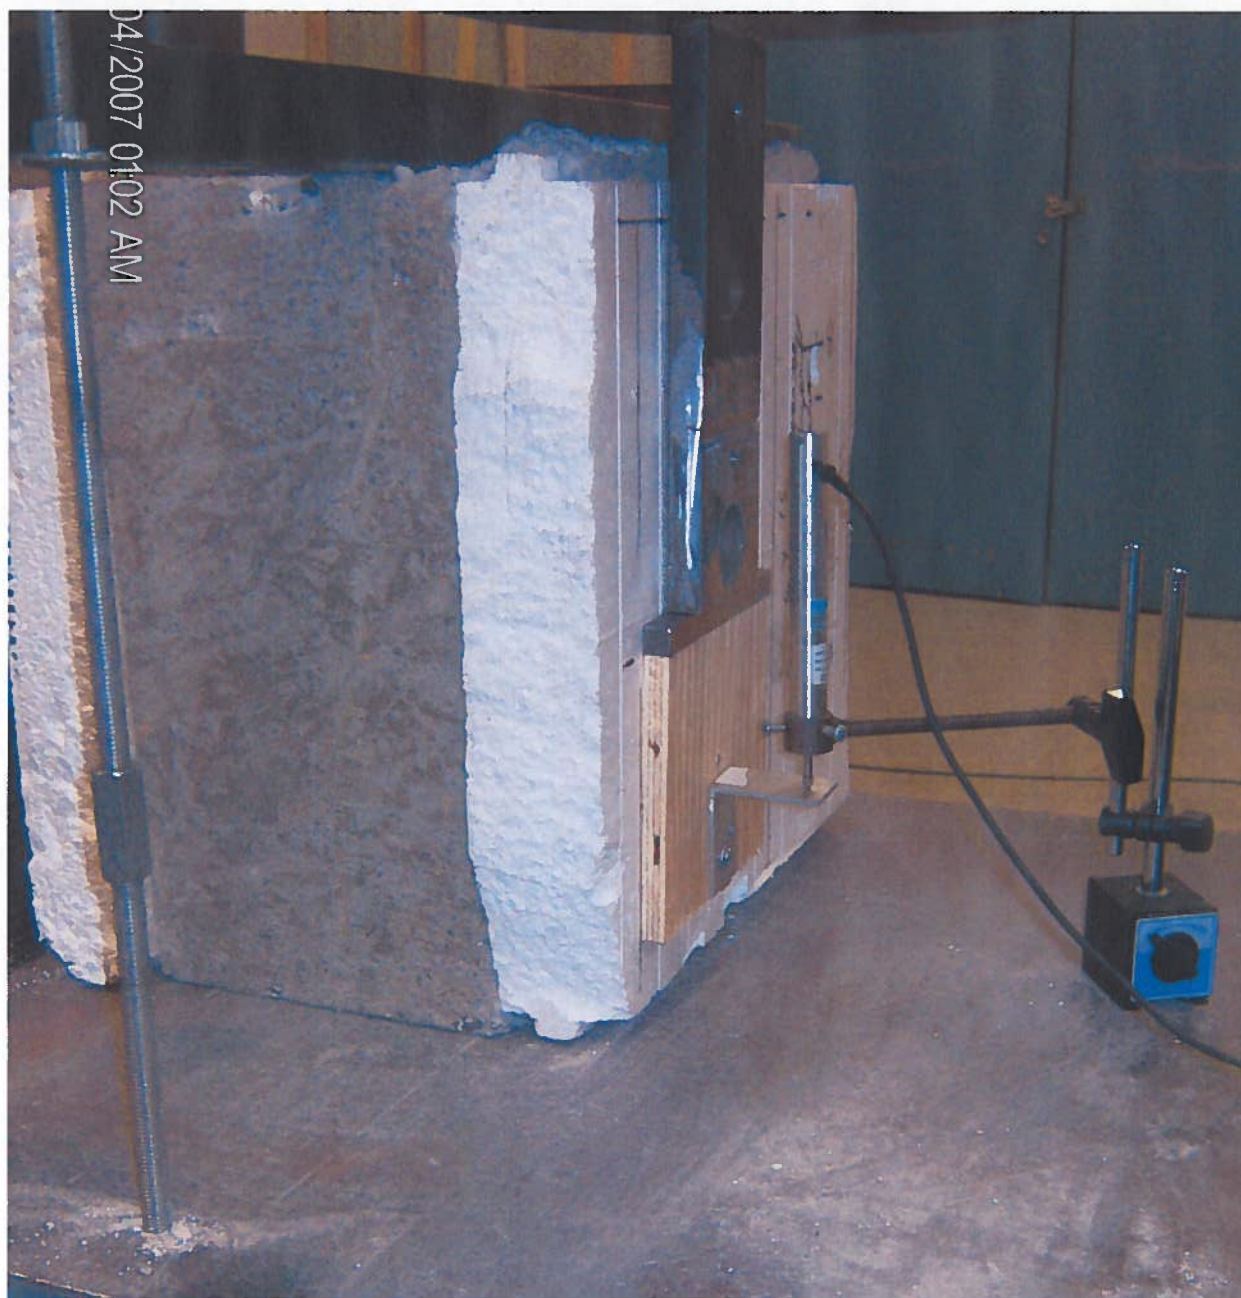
Showing Tree Island Fasteners 2" Drywall Nails
